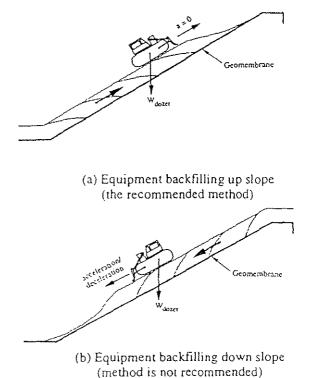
Construction equipment placing cover soil on slopes containing geosynthetics.
